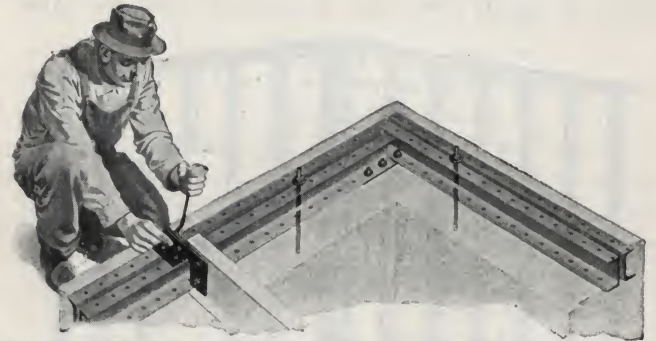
Floor Joists Bolted to Sills, Using Angle Connections Previously Installed
